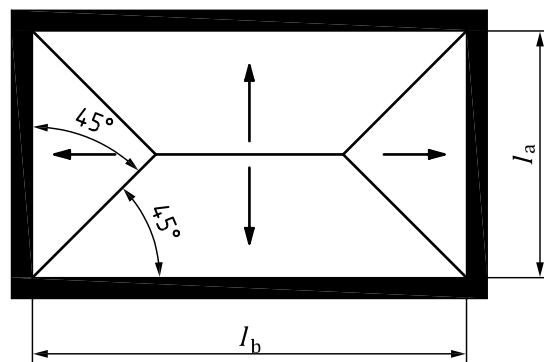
Tributary areas for minimum shear at the supports of two-way slabs supported on girders, beams or structural concrete walls
